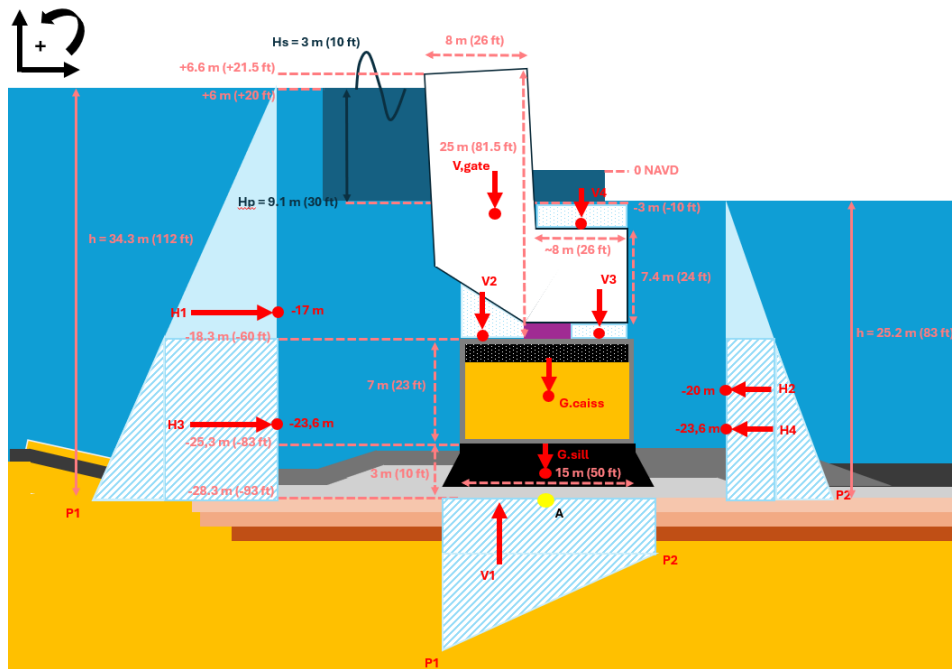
Schematic forces – Alternative 2 with caisson: closed barrier (governing case).
